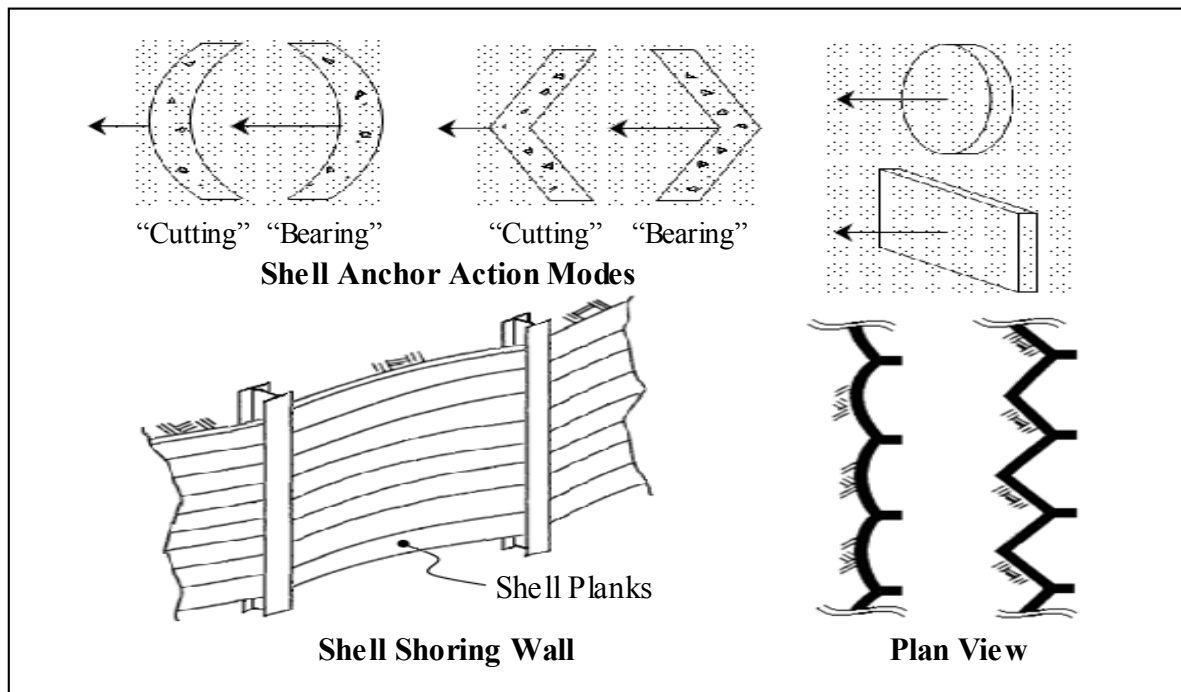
Shell Anchors & Shoring Wall Applications.
